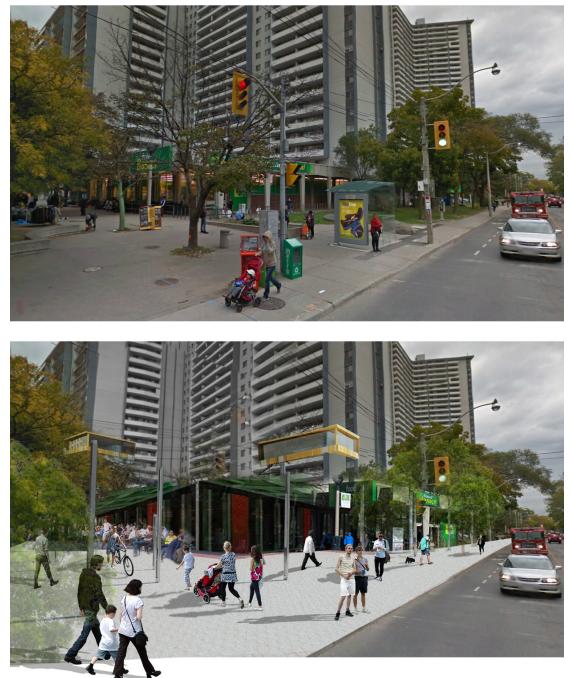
Proposed new view of the entrance to St. James Town along Wellesley Street (T) existing (B) proposed
